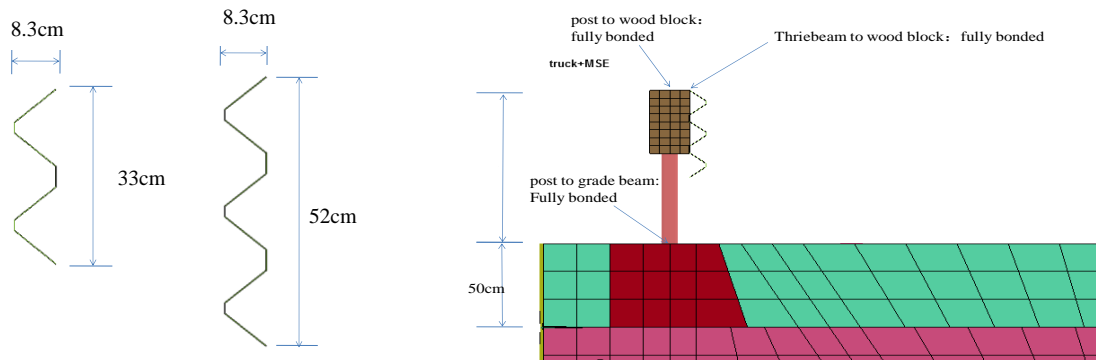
Cross-sectional geometries and arrangement of W-beam and thriebeam guardrails
